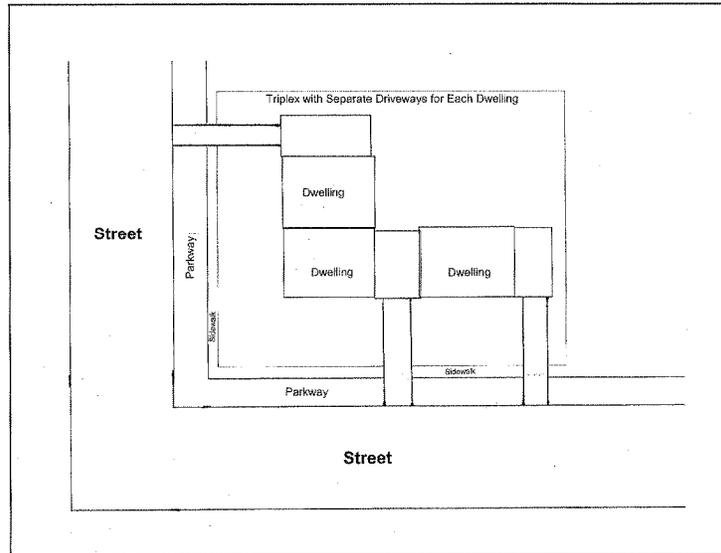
Driveway Exception for Duplexes and Triplexes
